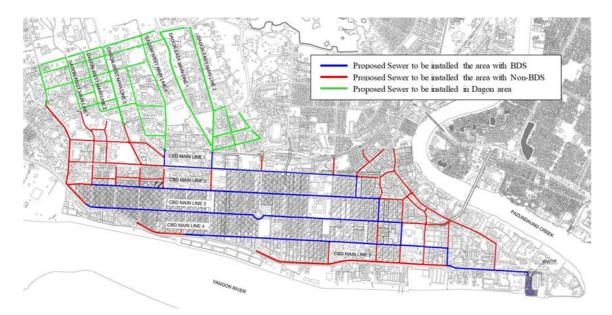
Trunk Sewer Alignment in Dagon Area
